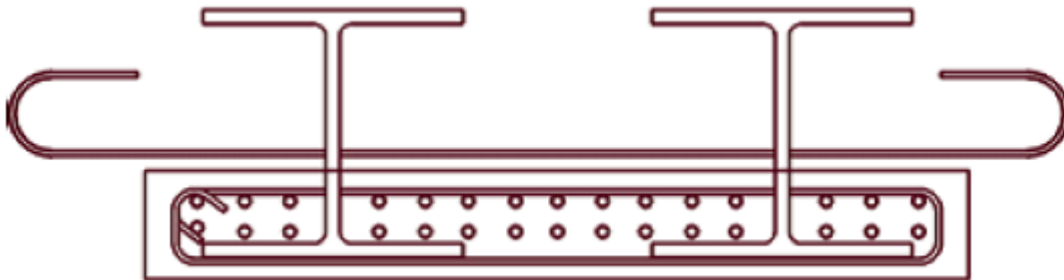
Dalle Preflex system (Culmo, 2009)
